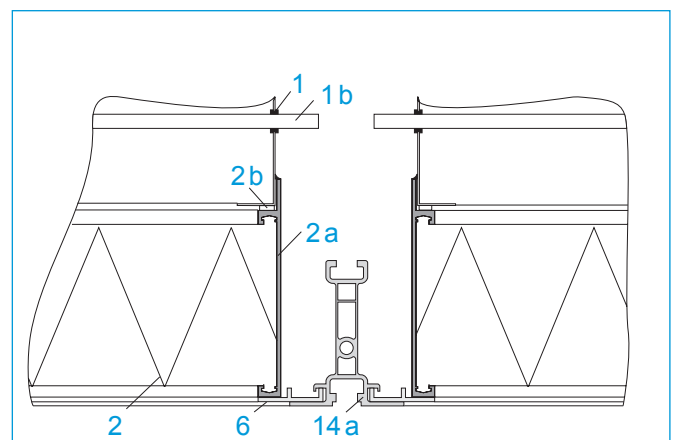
Installation step 2: lift up HEPA filter fan cell 2 and FFU-housing together, insert bearing rails 6 into dry ceiling UFR-55/70-T 14a and then lower the filter cell and the FFU-housing onto the bearing rails
